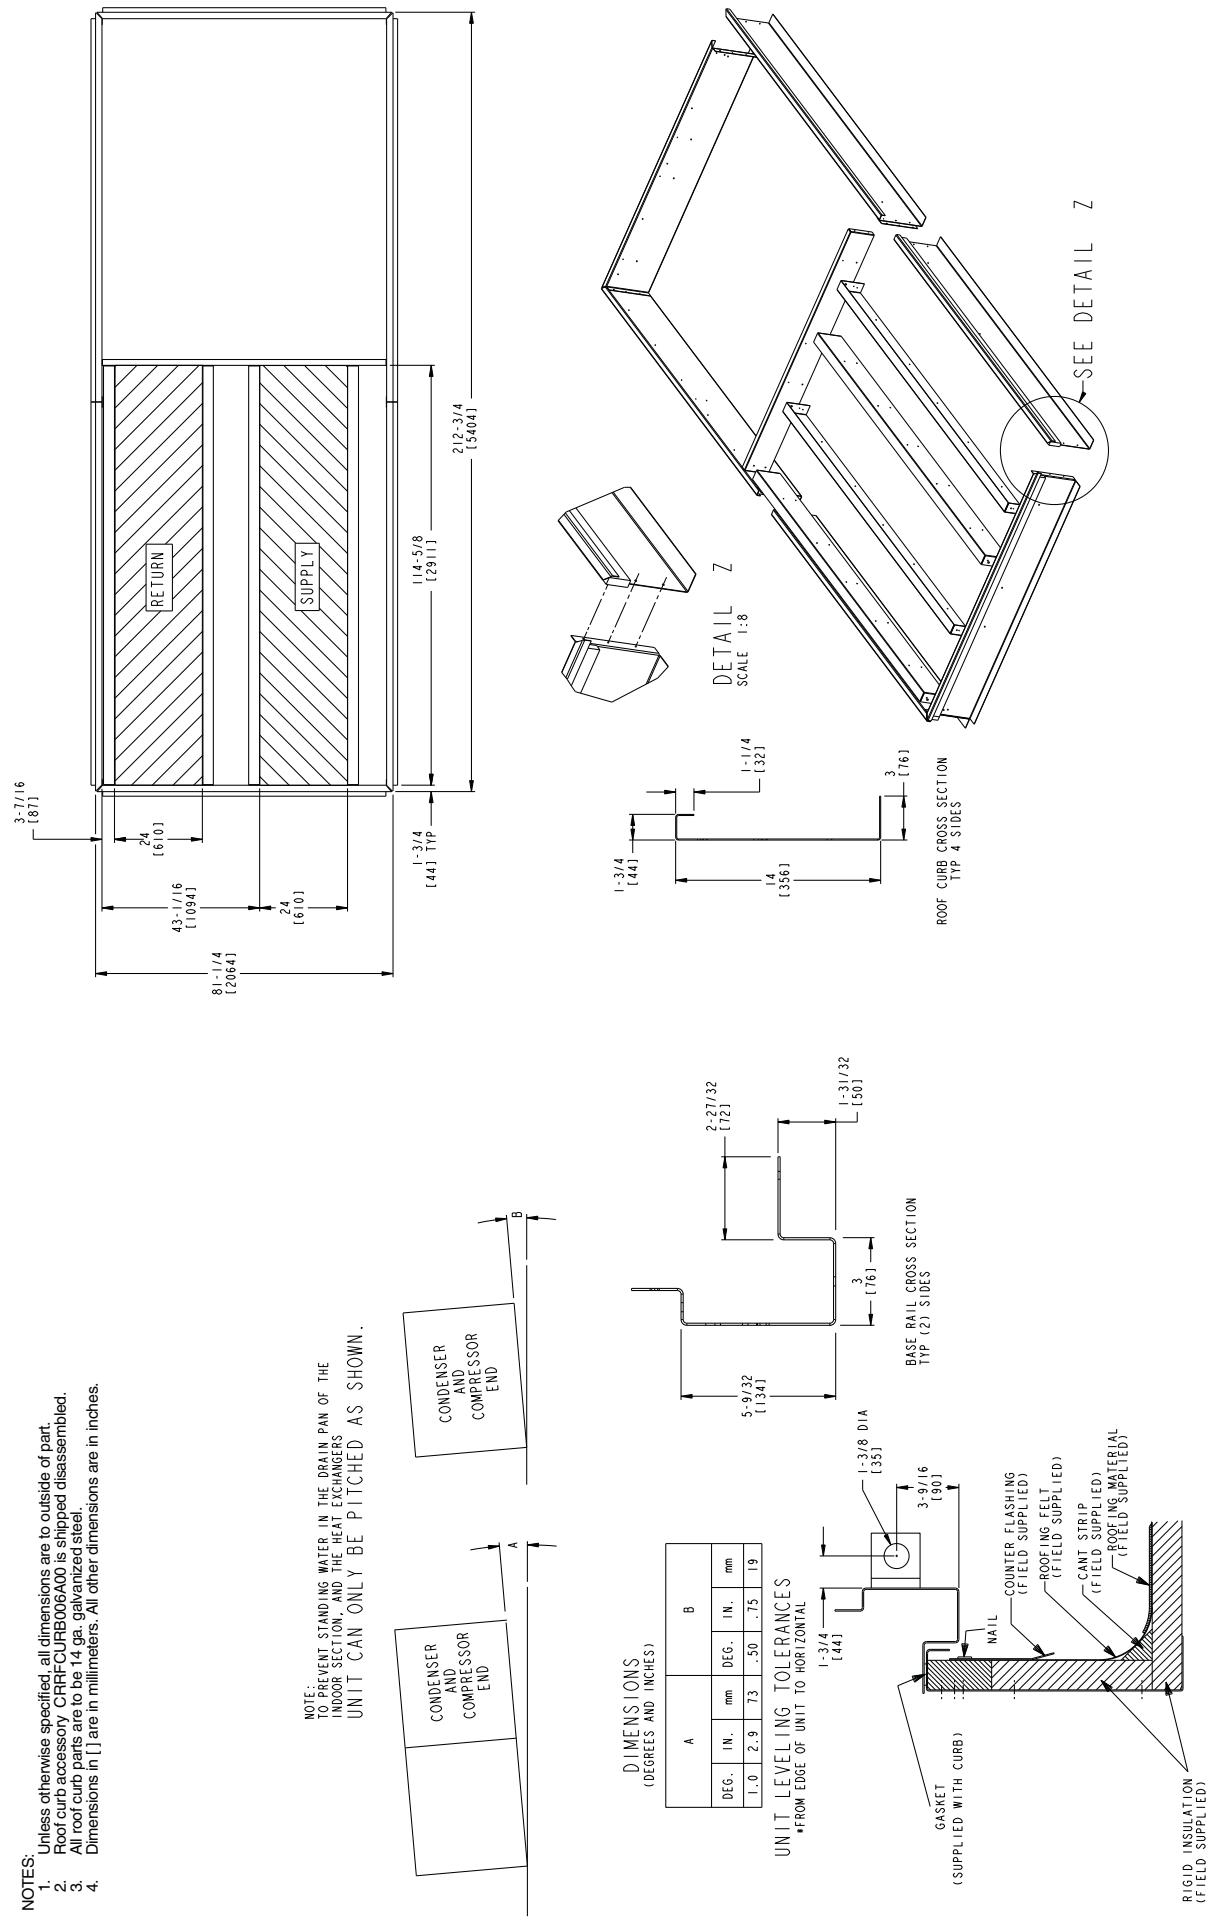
Roof Curb — 48A2,A3040-050 Units
